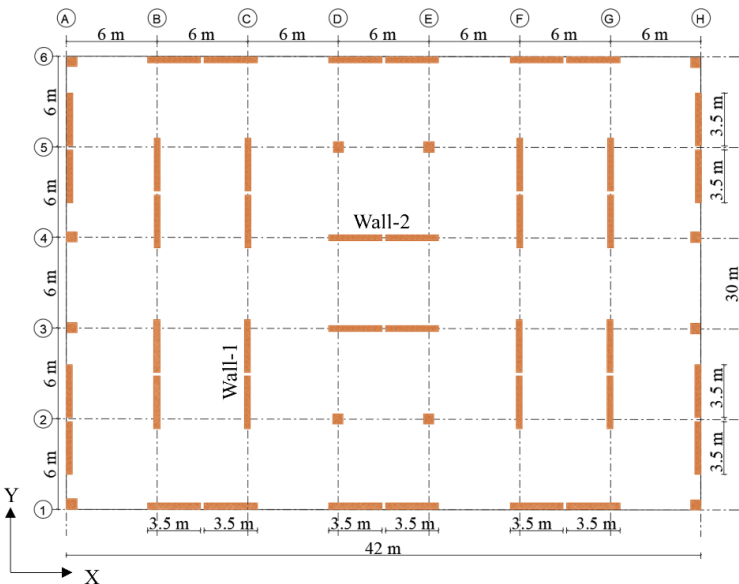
Typical floor layout of a 22-storey prototype mass-timber building with PT-CLT shear walls.
